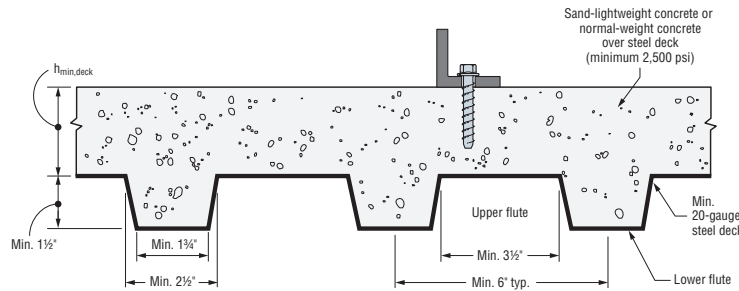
Installation of 1/4"- and 3/8"-Diameter Anchors in the Topside of Concrete over Steel Deck
